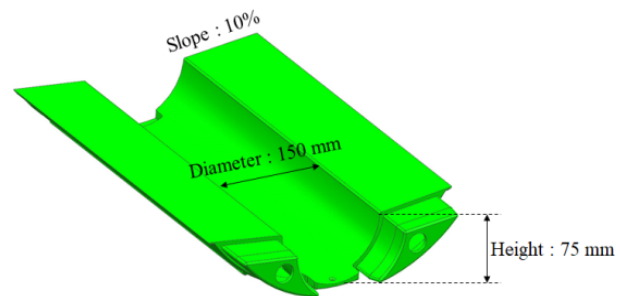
3-D design of complex cross section to install by trenchless method in D450 mm pipe.
